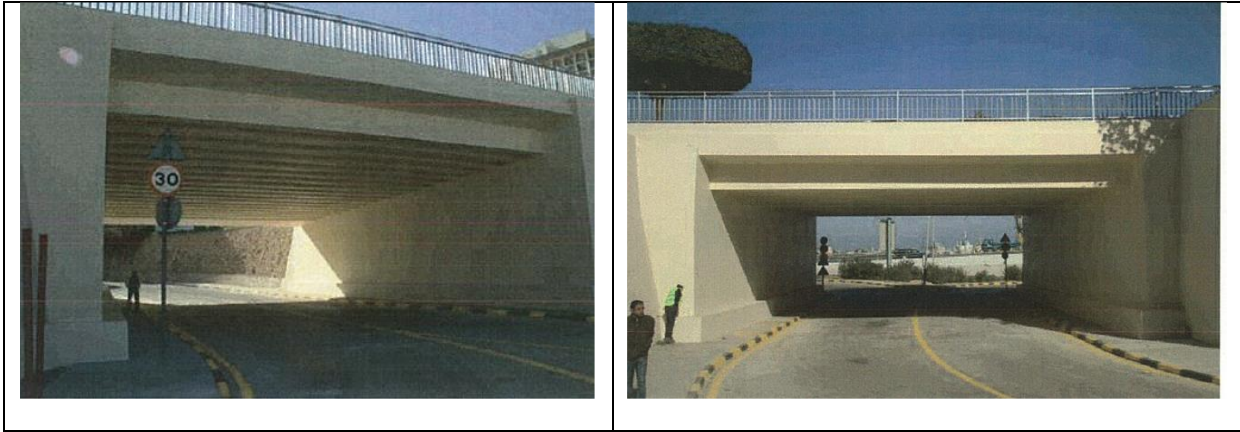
& VI-174. The view of bridge after reconstruction
